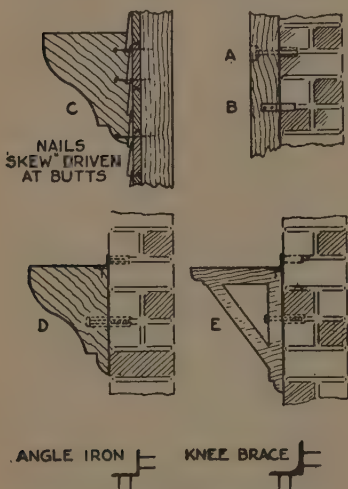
Methods of fastening flower boxes, screens, and woodwork to siding-covered walls and to brick, stucco, and other masonry walls.
